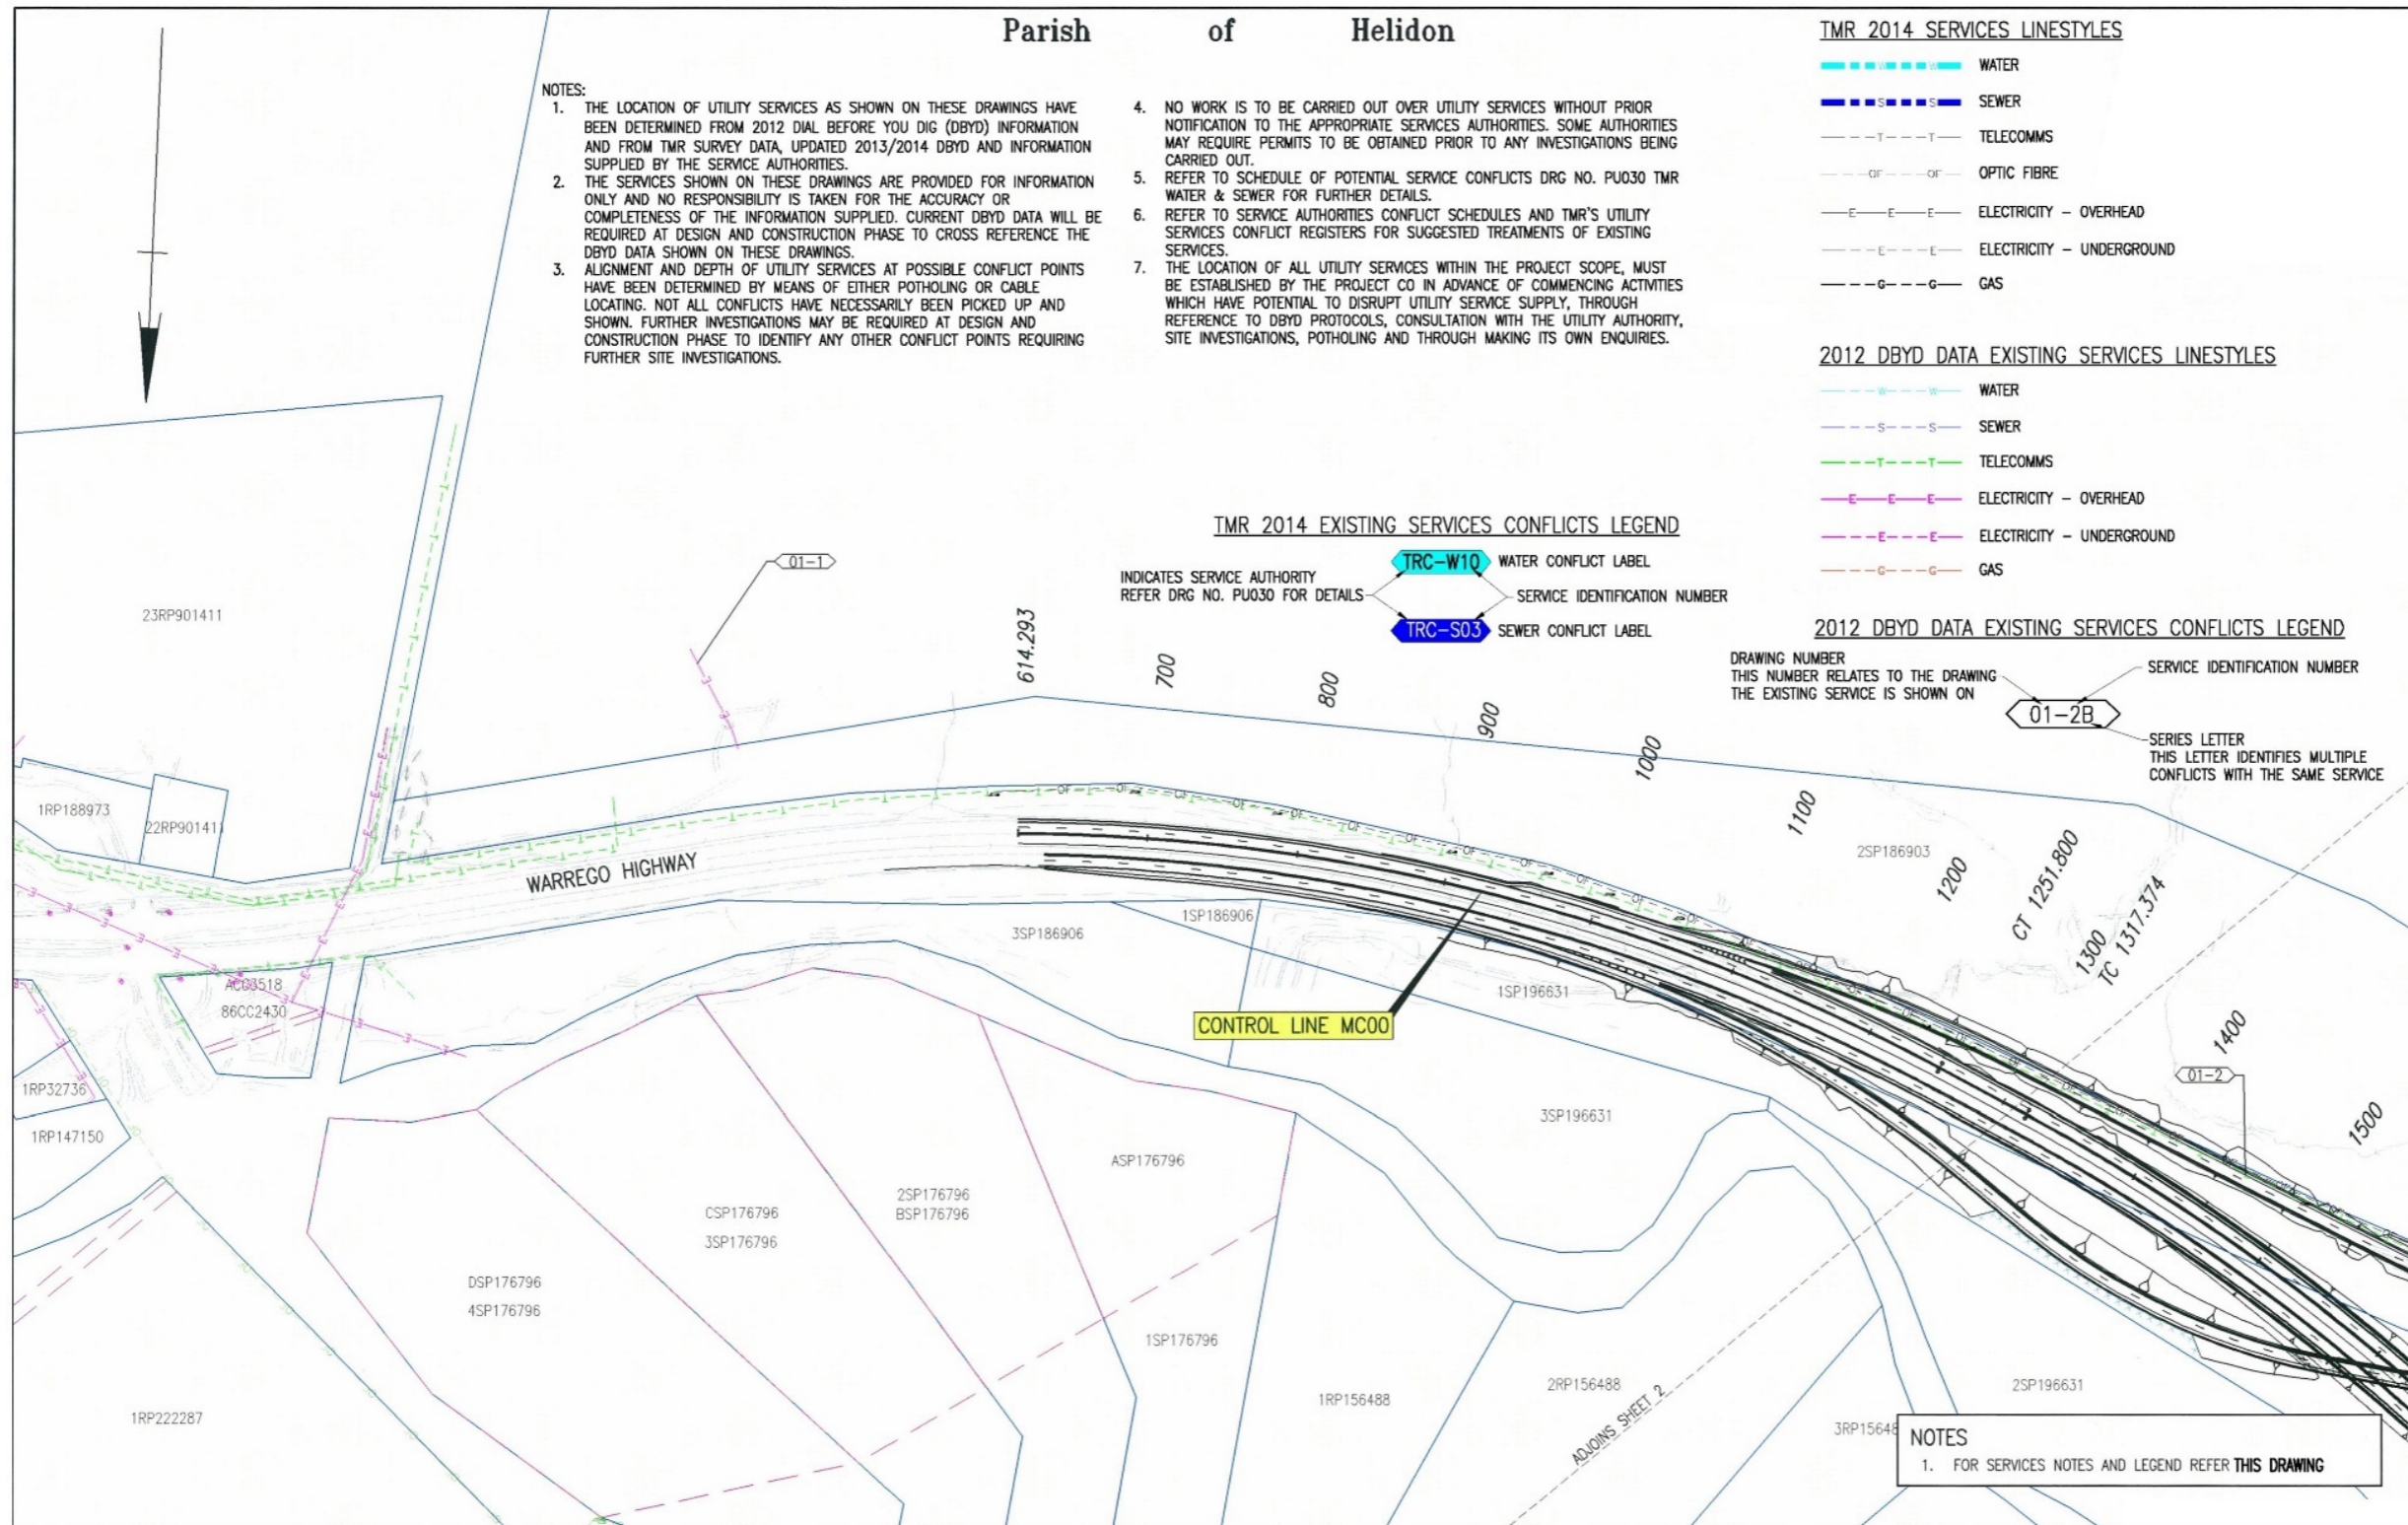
(h) – Public utility plant – Conflict Plans generic example – sheet 4 of 11
